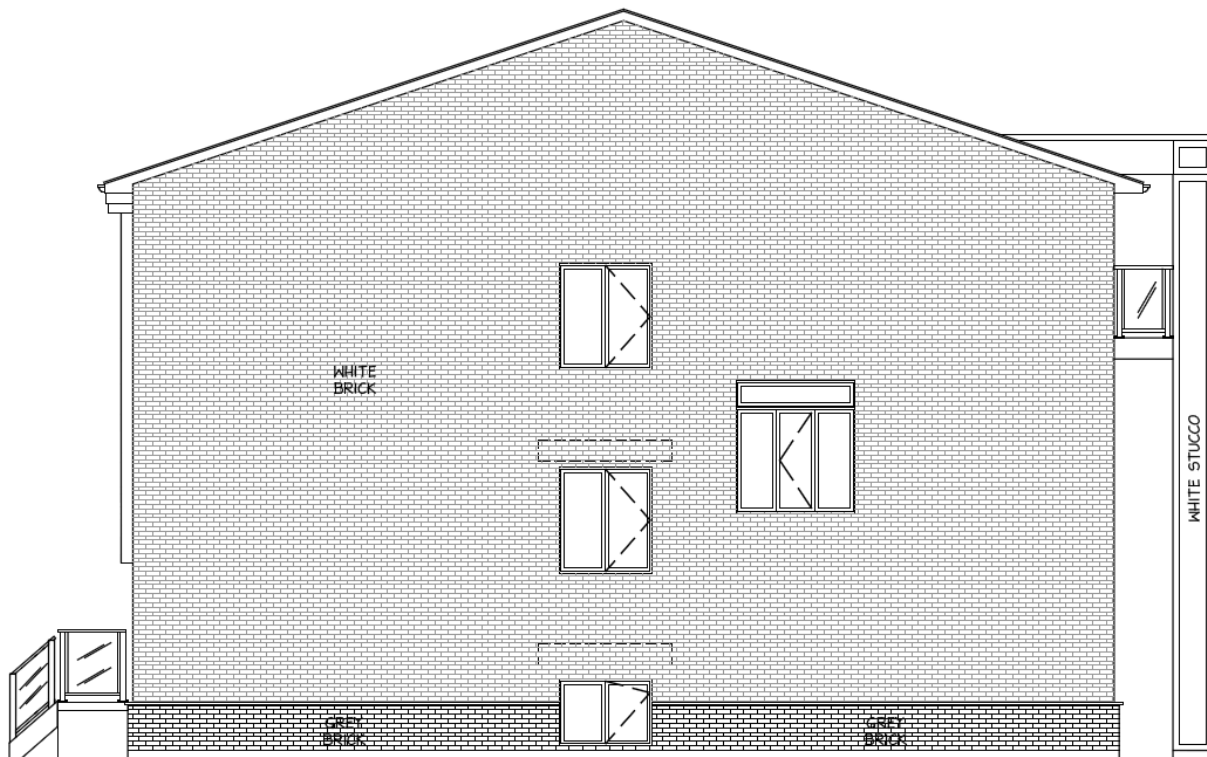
Conceptual Rear Elevation, Details (Excerpt)
